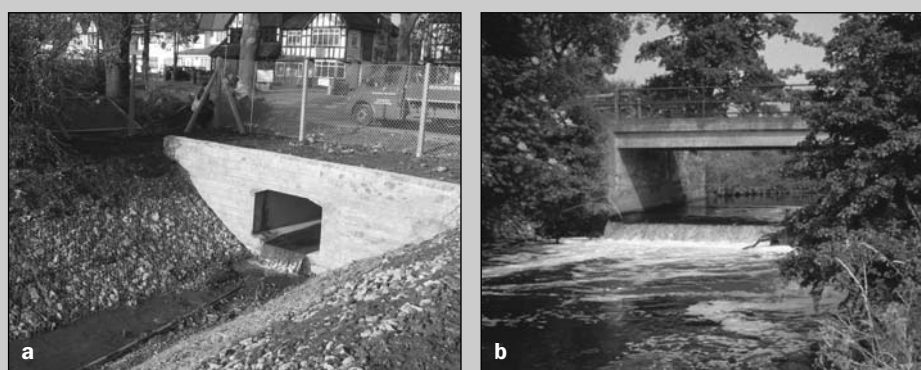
Outfall from a culvert (a) and a structure generally considered a bridge (b)
